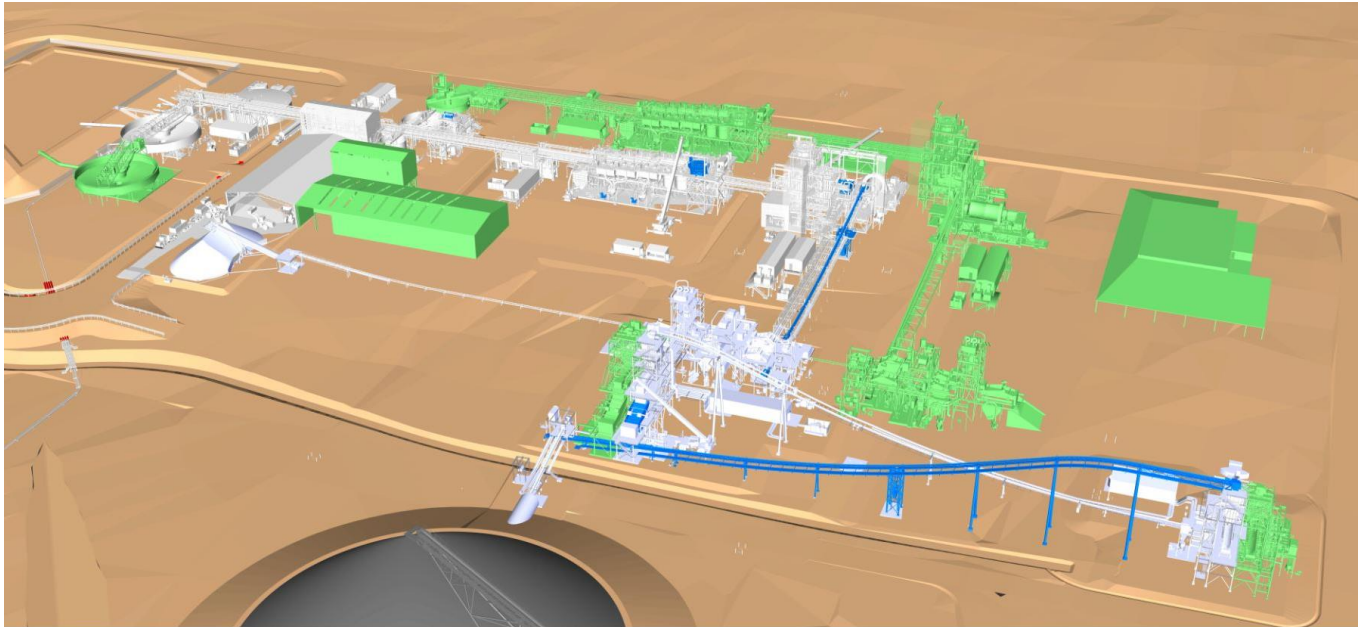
Proposed Plant Layout for Stage 2 5Mtpa operation
